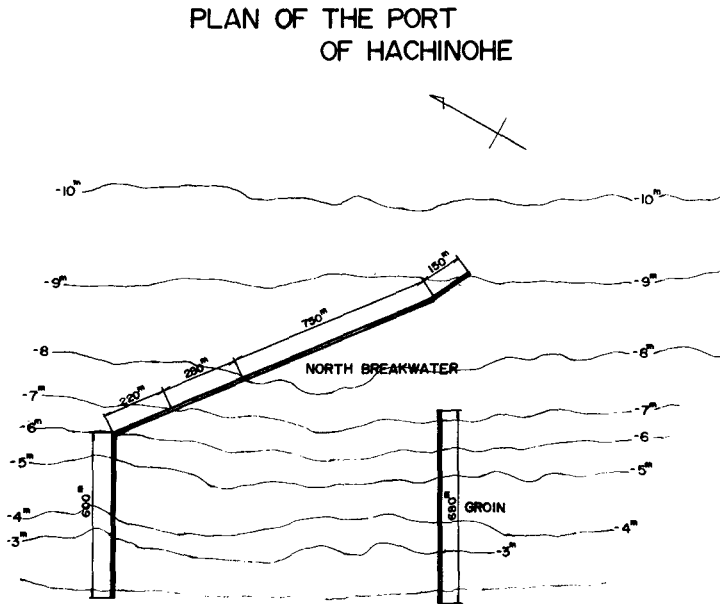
PLAN OF THE PORT OF HACHINOHE
